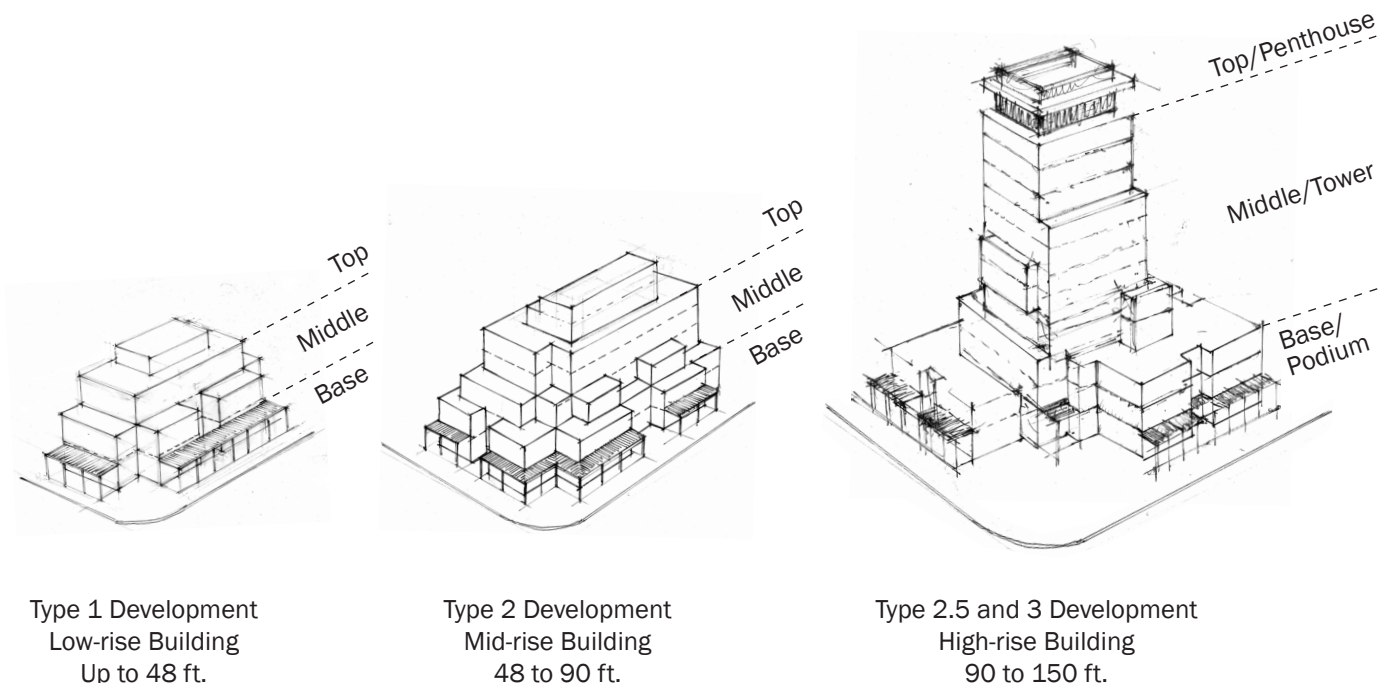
Subdivide into Base, Middle, & Top to Reduce Apparent Building Size & Mass
